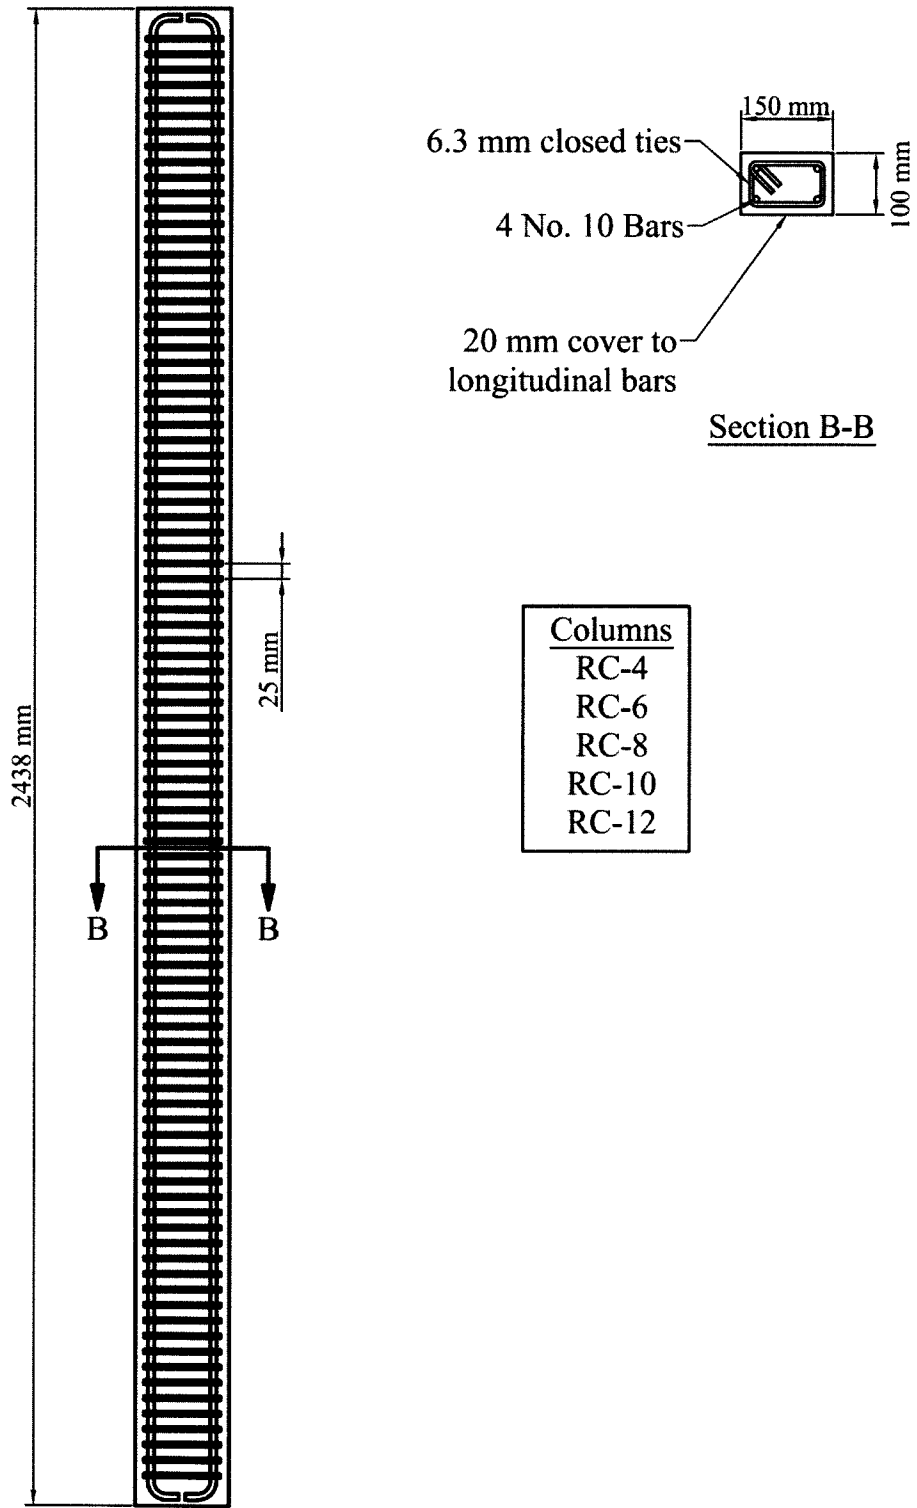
Reinforcement Details of 100x150 mm Seismic Columns
